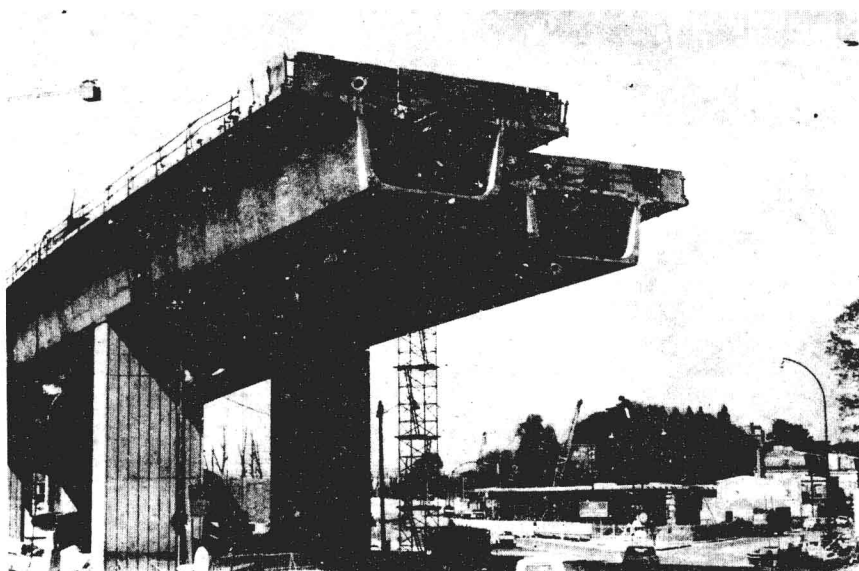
Twin box girder bridge under construction using the segmentally cast cantilever method.
